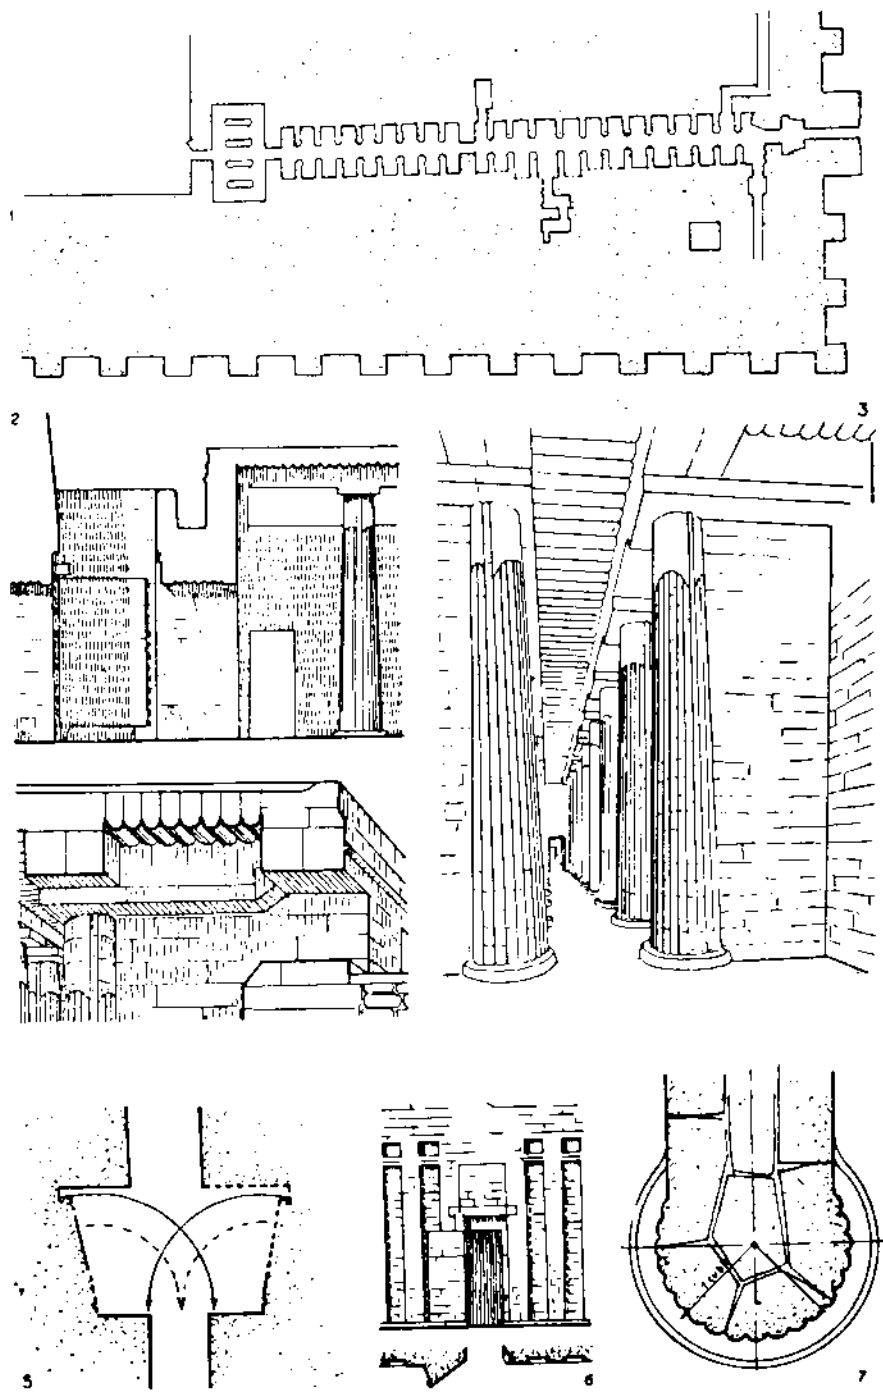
The processional hall in Djoser's complex: plan (1), section at the entrance (2), restored perspective (3), detail of a window (4), assumed closing of door-leaves in prototype (5), restored elevation of western doorway (6) and detailed section of column (7).
